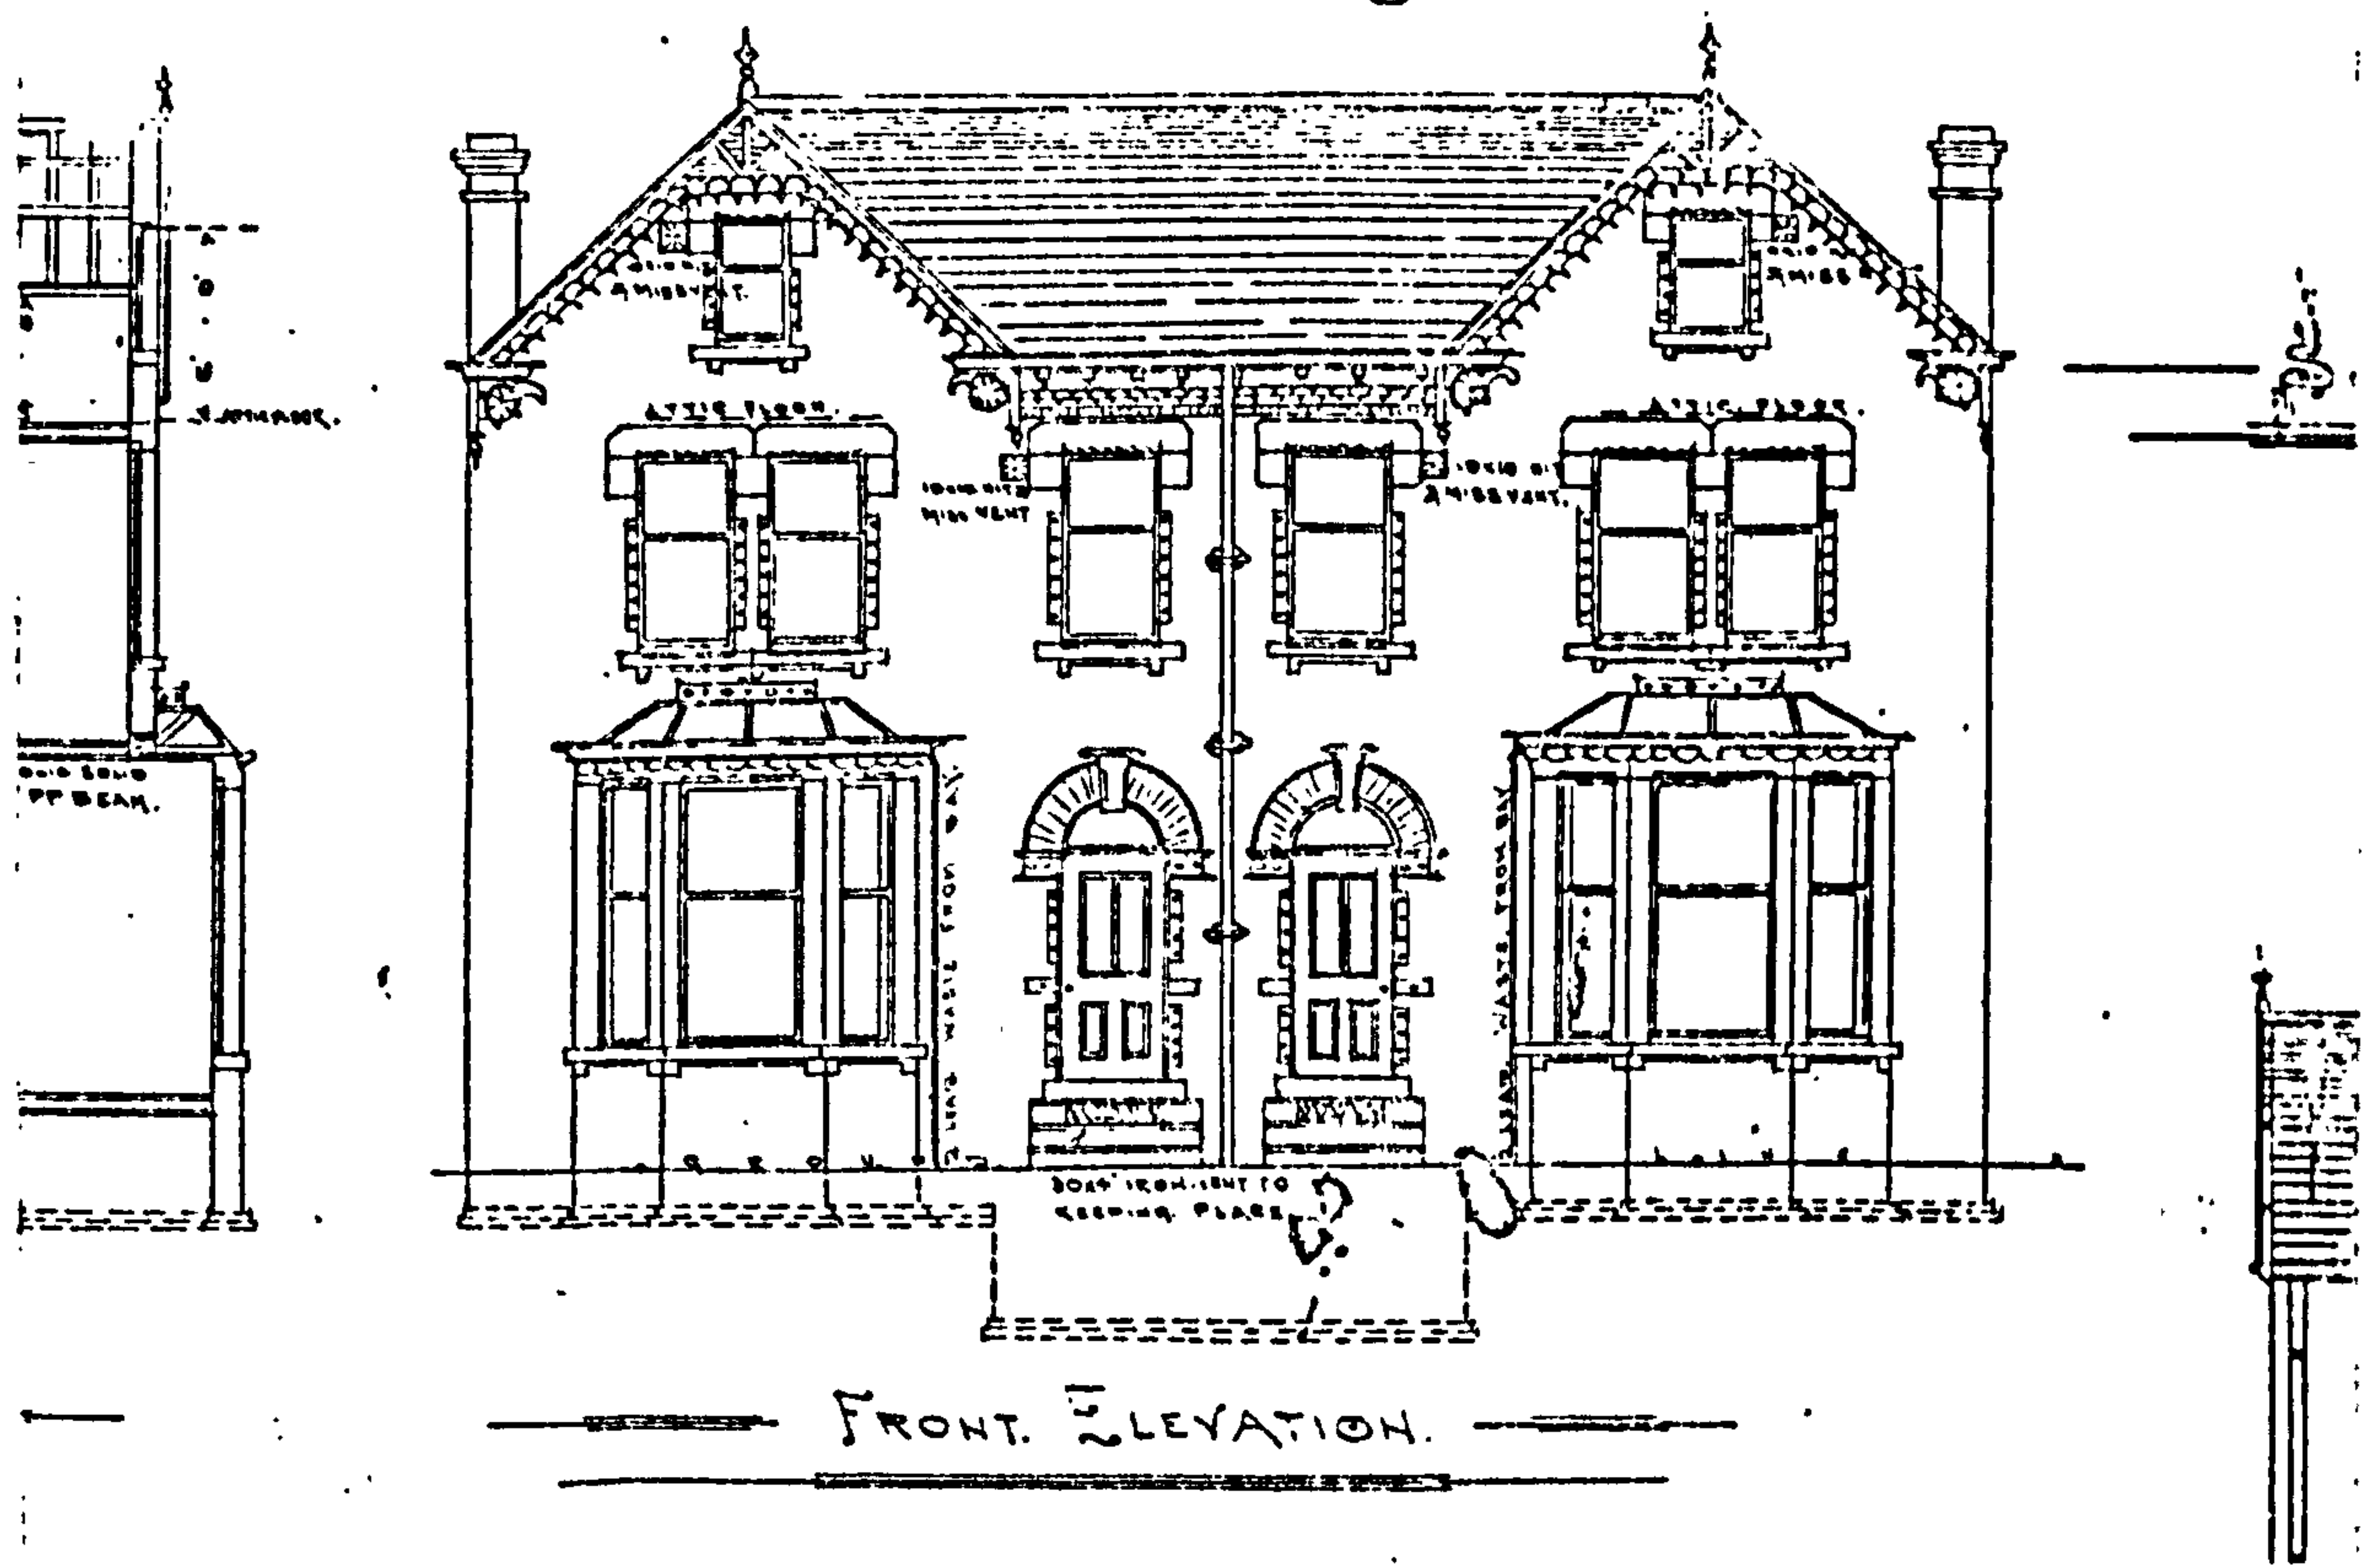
Deposited elevation of two semi-detached houses, Cardigan Road (G. Hutton 1892).
